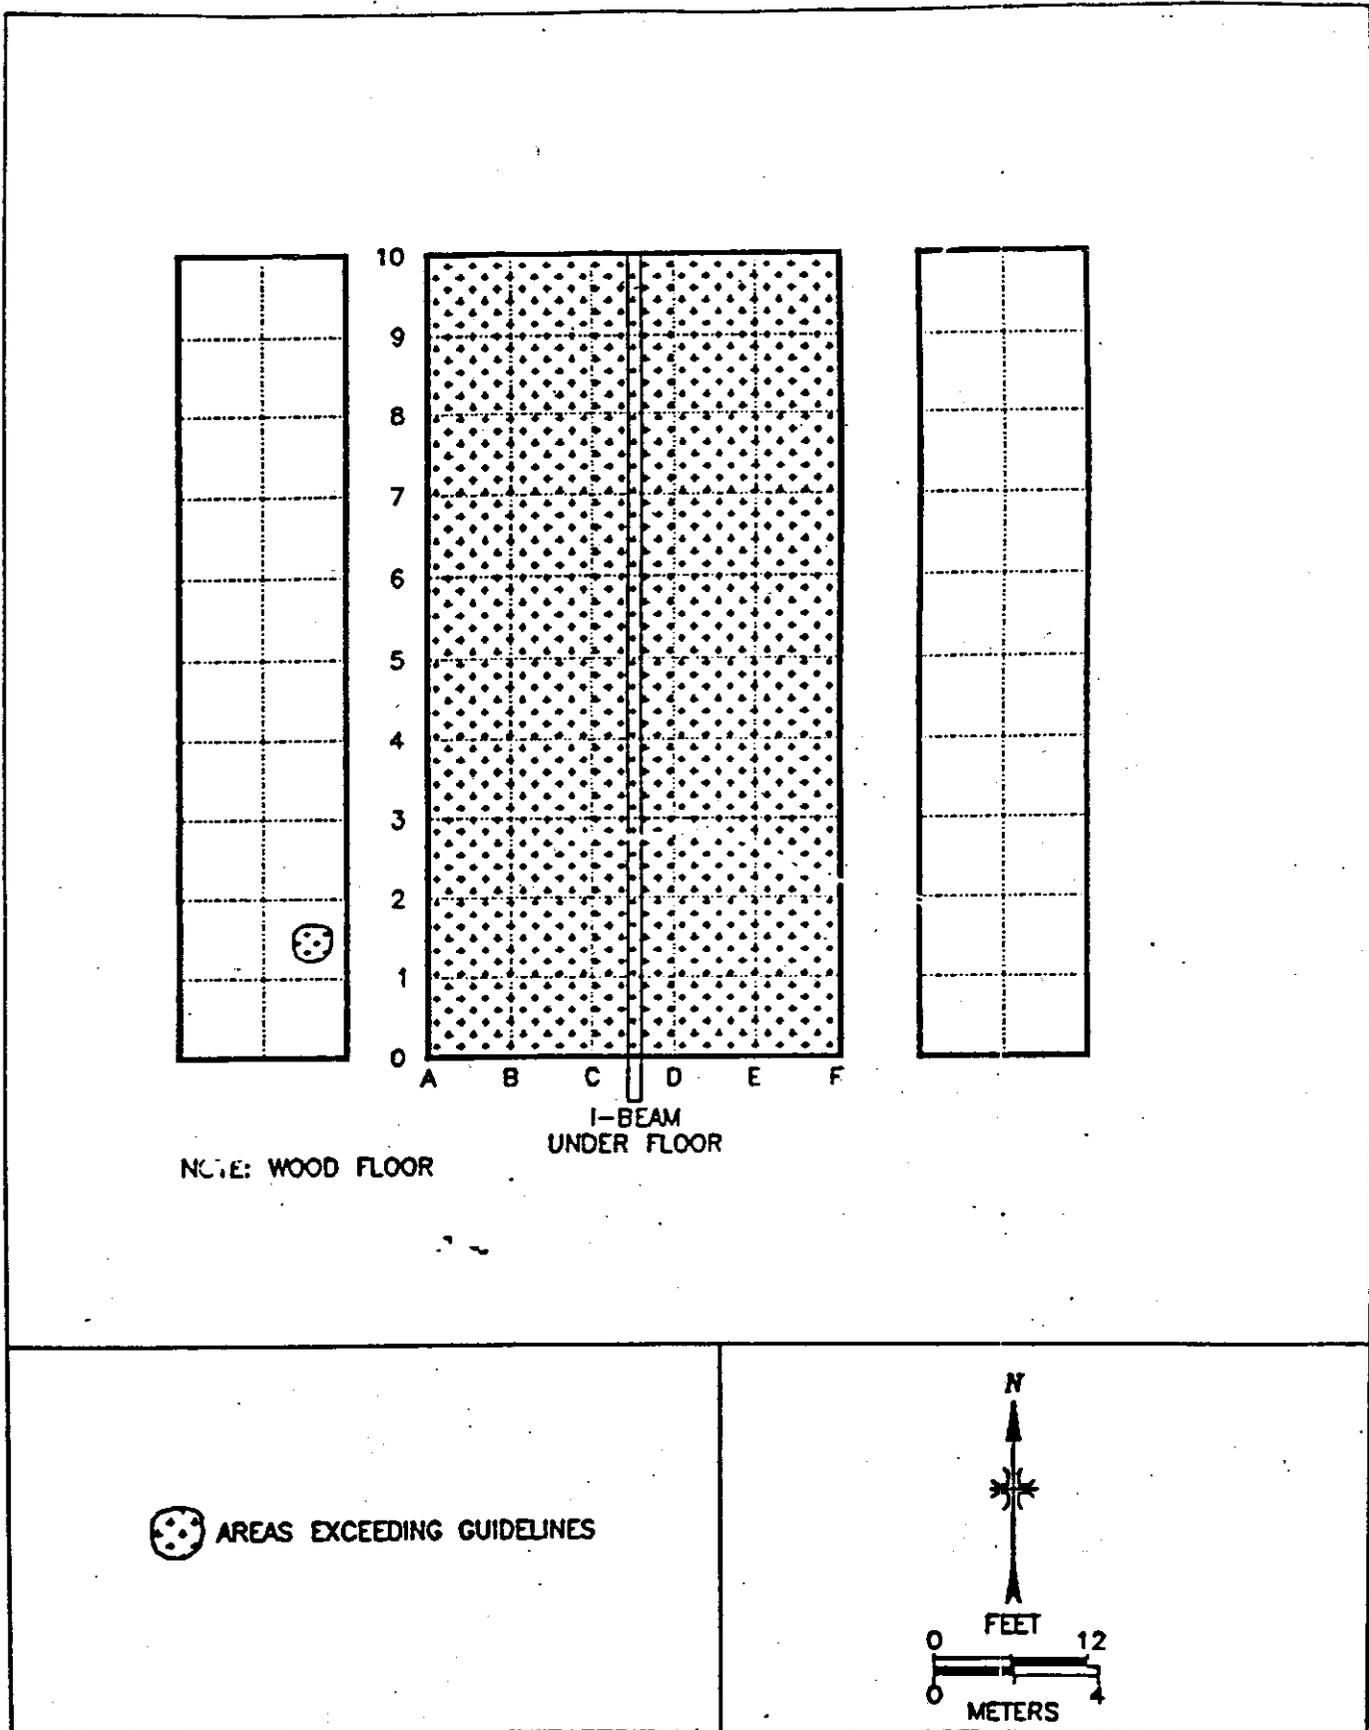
Mezzanine Floor and Walls – Areas Exceeding Guidelines
